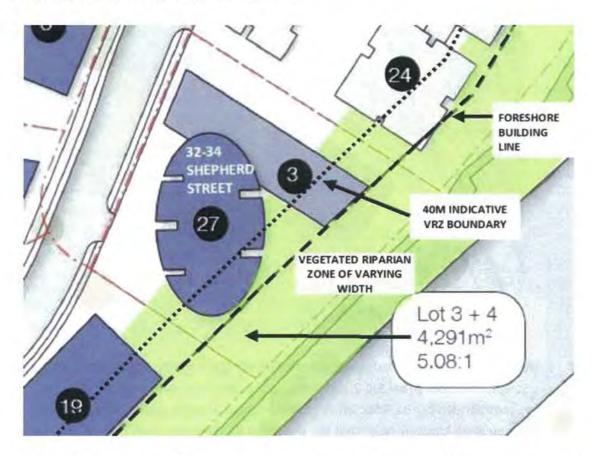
The proposed development plan for the subject site at 32-34 Shepherd Street, Liverpool (from SJB 2016) showing the indicative 40m riparian setback recommended by the NSW Office of Water and a variable width VRZ to compensate for the building location. Note that the proposed building construction does not encroach into the inner 50% of the VRZ or beyond the council foreshore building line.
